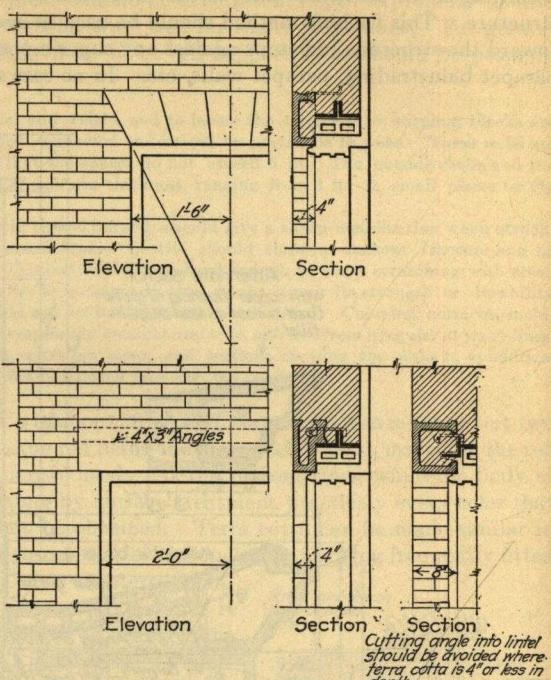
Elevations and sections of three simple types of lintels in brick walls.
